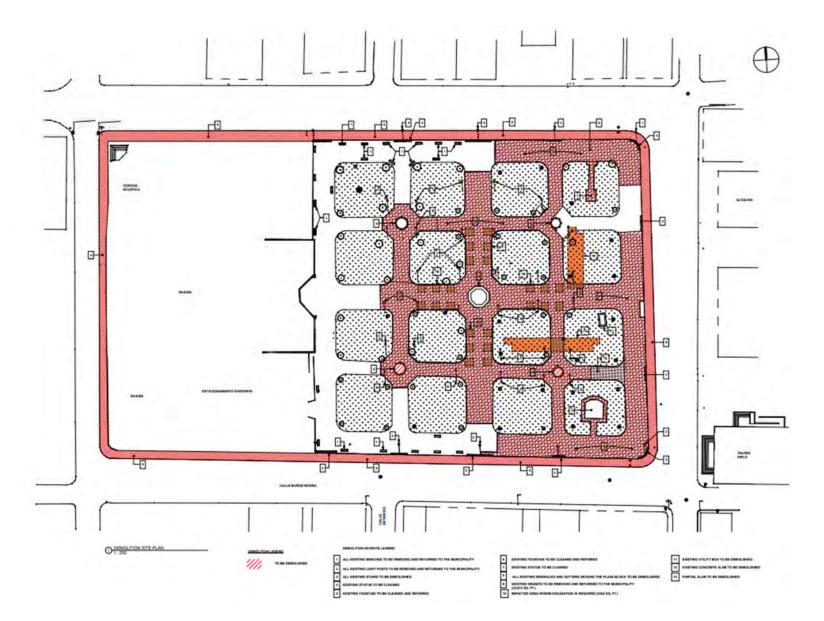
Demolition site plan of Luis Muñoz Rivera Public Plaza (Source: Sheet #DS101, 60% Construction Document, EM Architects, PSC)
